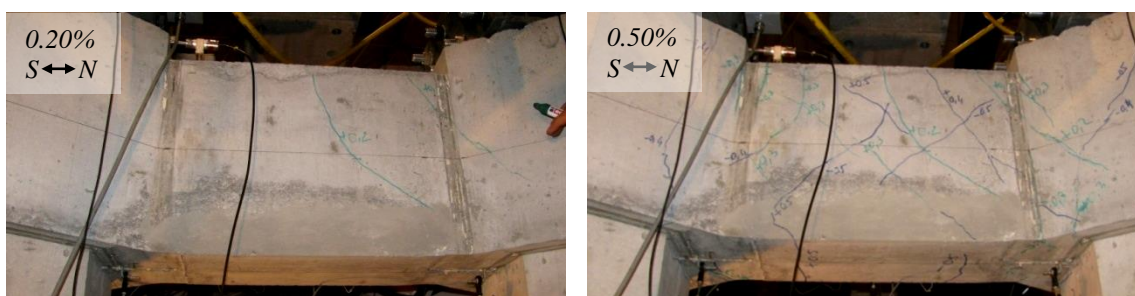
SP_M01 Beam cracking pattern
